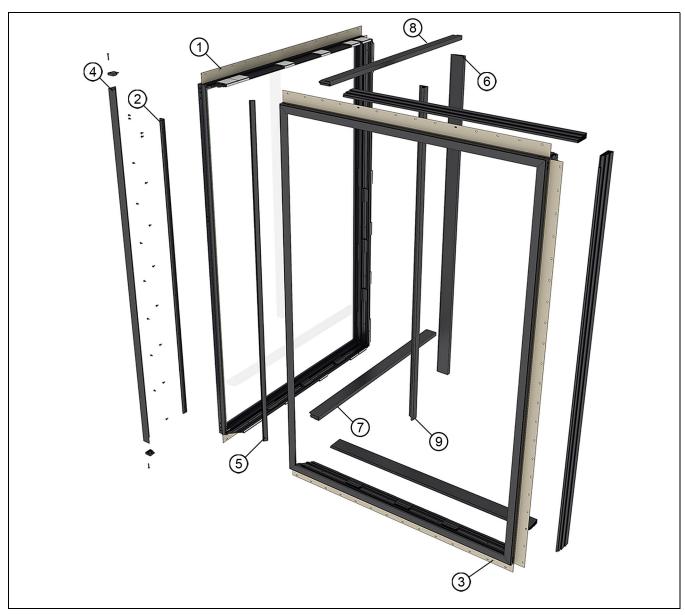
Exploded view of corner window assembly. Handing as seen from exterior.
